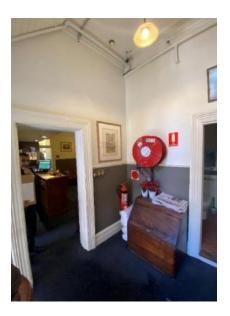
View from 1.02 into 1.13 (reception) (left) and 1.15 (bathroom) (right). The bathroom was part of the original design of the building, although the tiling and wall linings date from the 1980s. Source: TKD Architects 2020.
